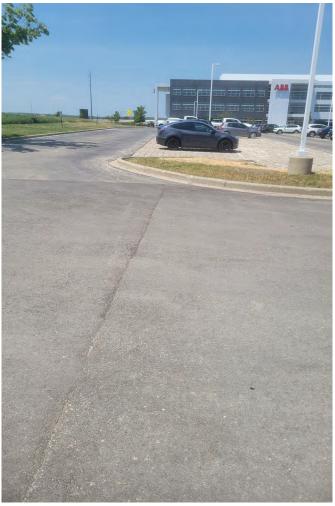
Asphalt paved parking lot within southeastern portion of Lot 3 (east of ABB building). Permeable pavers along parking rows of ABB parking lot. Mulched and vegetated topsoil cover within greenspace islands (limited use). View to west; photograph taken on June 1, 2023.
